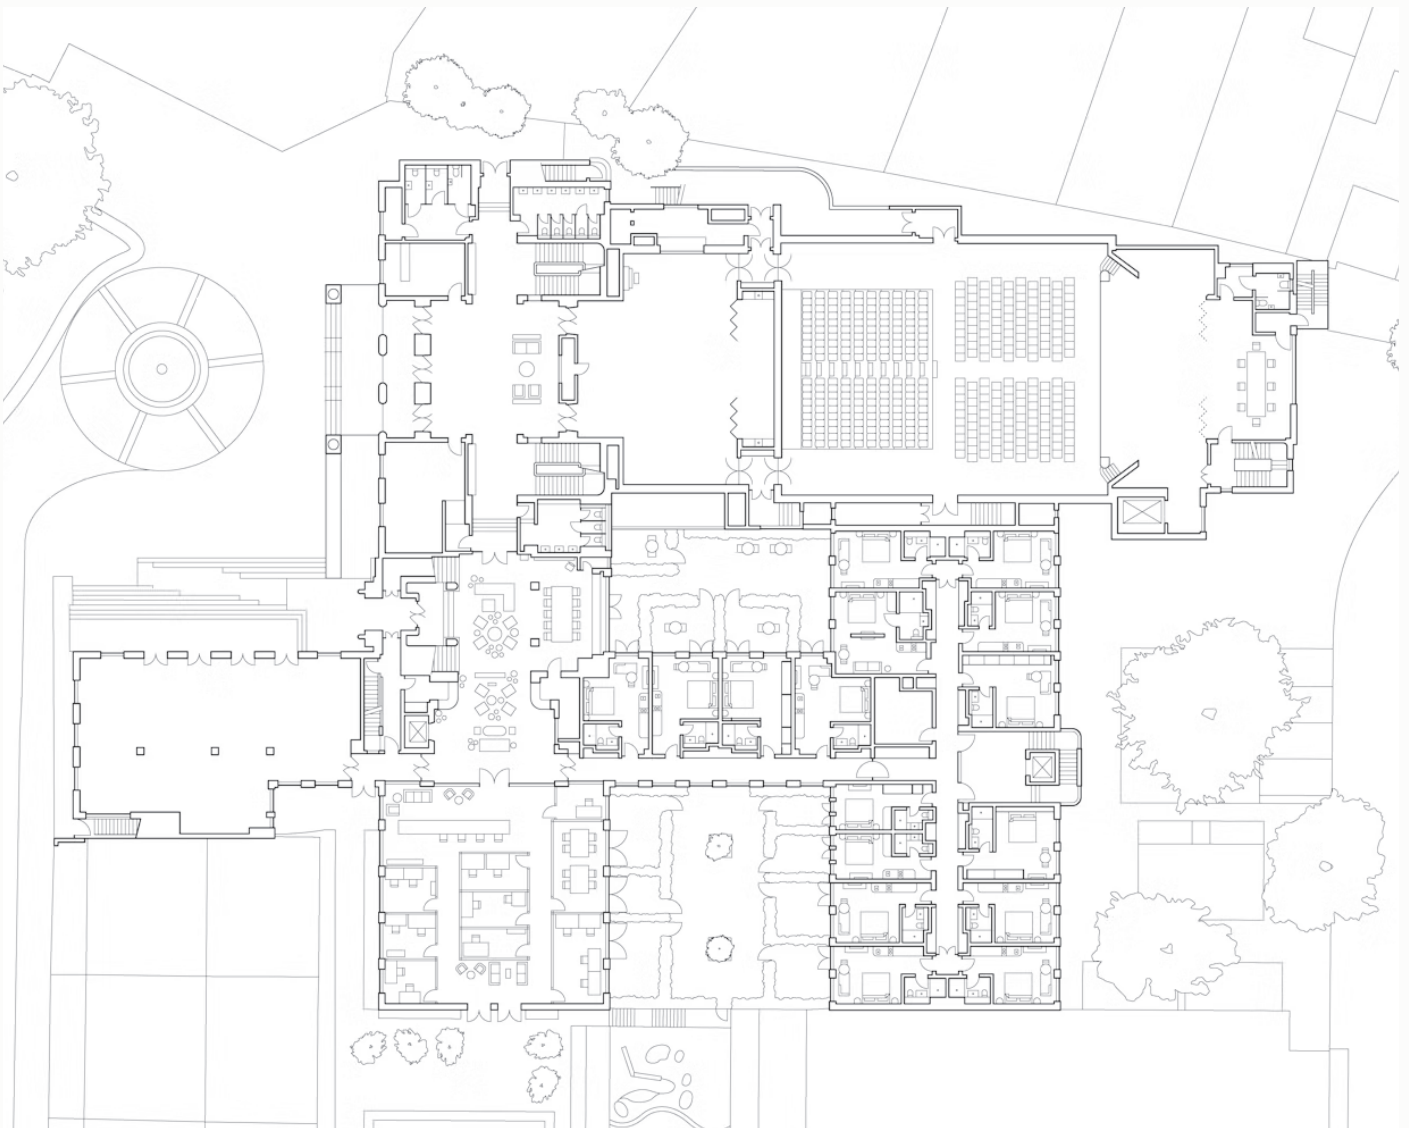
Hornsey Town Hall Ground Floor Plan, Make Architects
